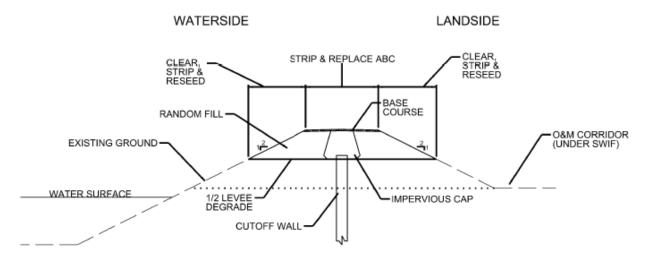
Sacramento River Reaches D through F Cutoff Wall Typical Section
